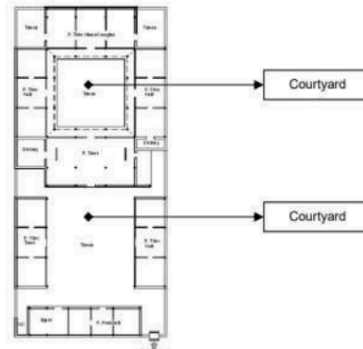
Traditional Chinese Building Floor Plan (Source: Handinoto, 2008)
